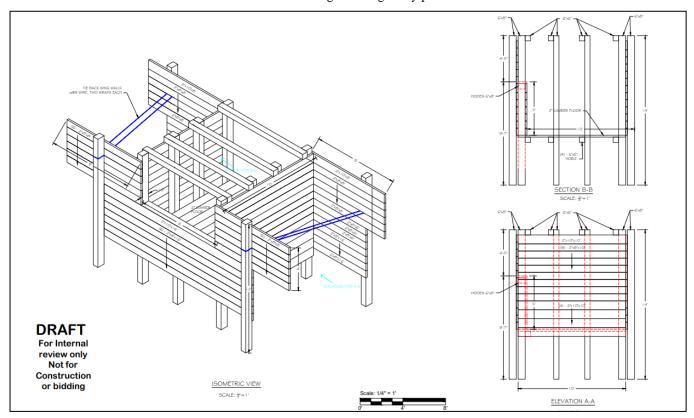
Draft design for pin-and-plank style timber fish barrier.
